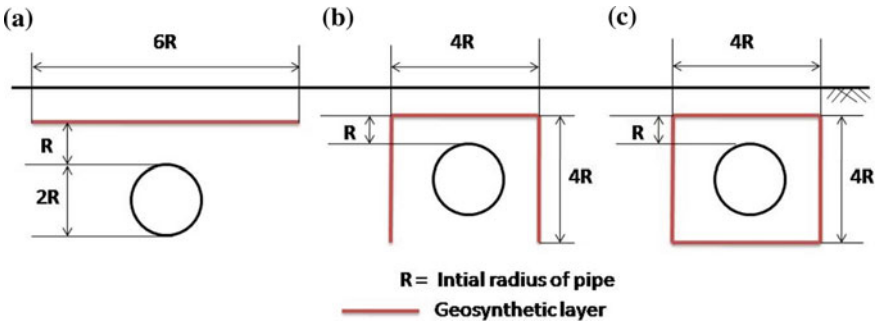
Reinforcement configurations tested by Tupa and Palmeira [31]. a Horizontal reinforcement. b Inverted U reinforcement. c Envelope
